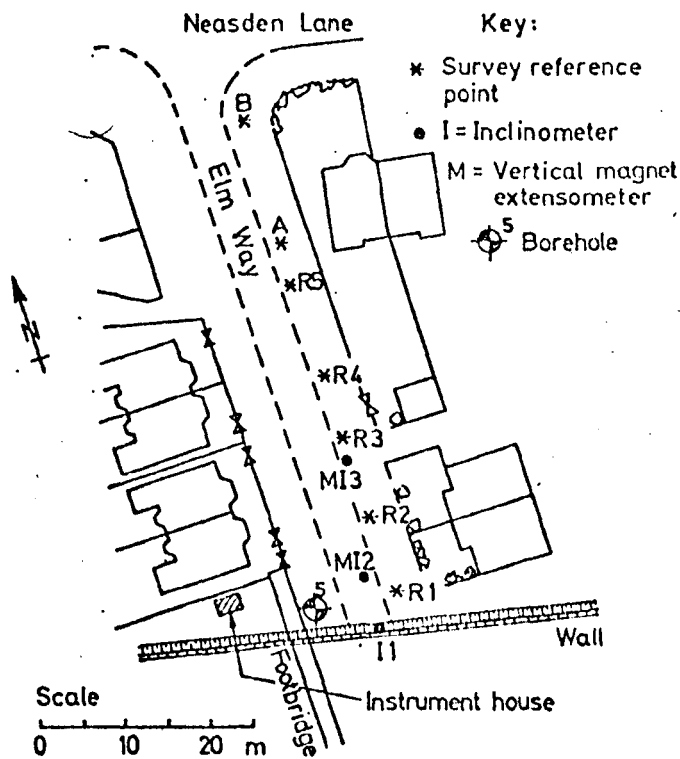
PLAN OF INSTRUMENTED AREA (After Sills et al, 1977)
